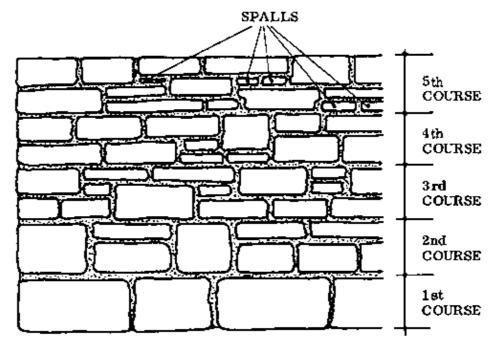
HAMMER-DRESSED ASHLAR MASONRY
